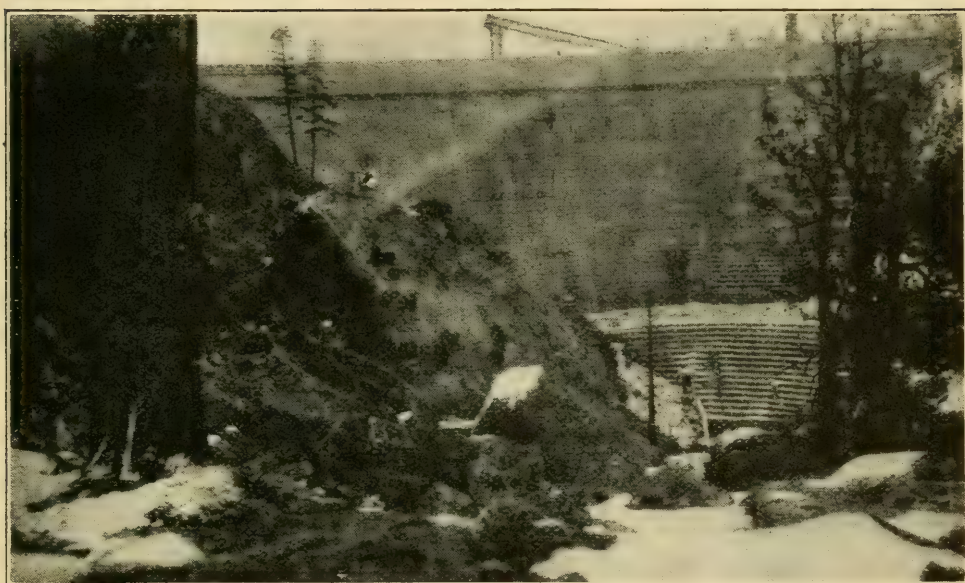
DOWN-STREAM FACE OF LAKE SPAULDING DAM, 225 FEET HIGH ABOVE RIVER BED.
